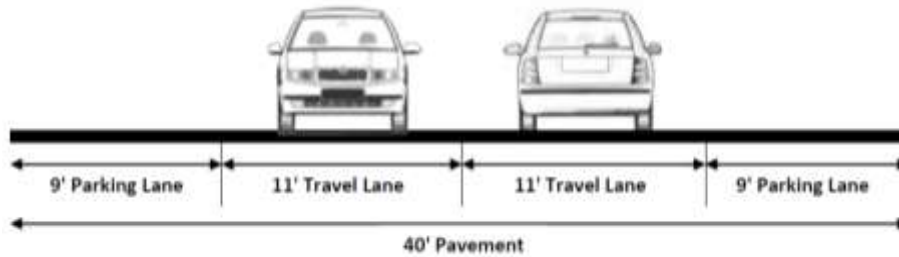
Union Street Pavement Widths (in feet)
